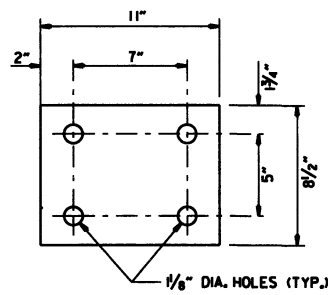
DETAILS OF WOOD LINE POST CONNECTIONS (W-BEAM)
